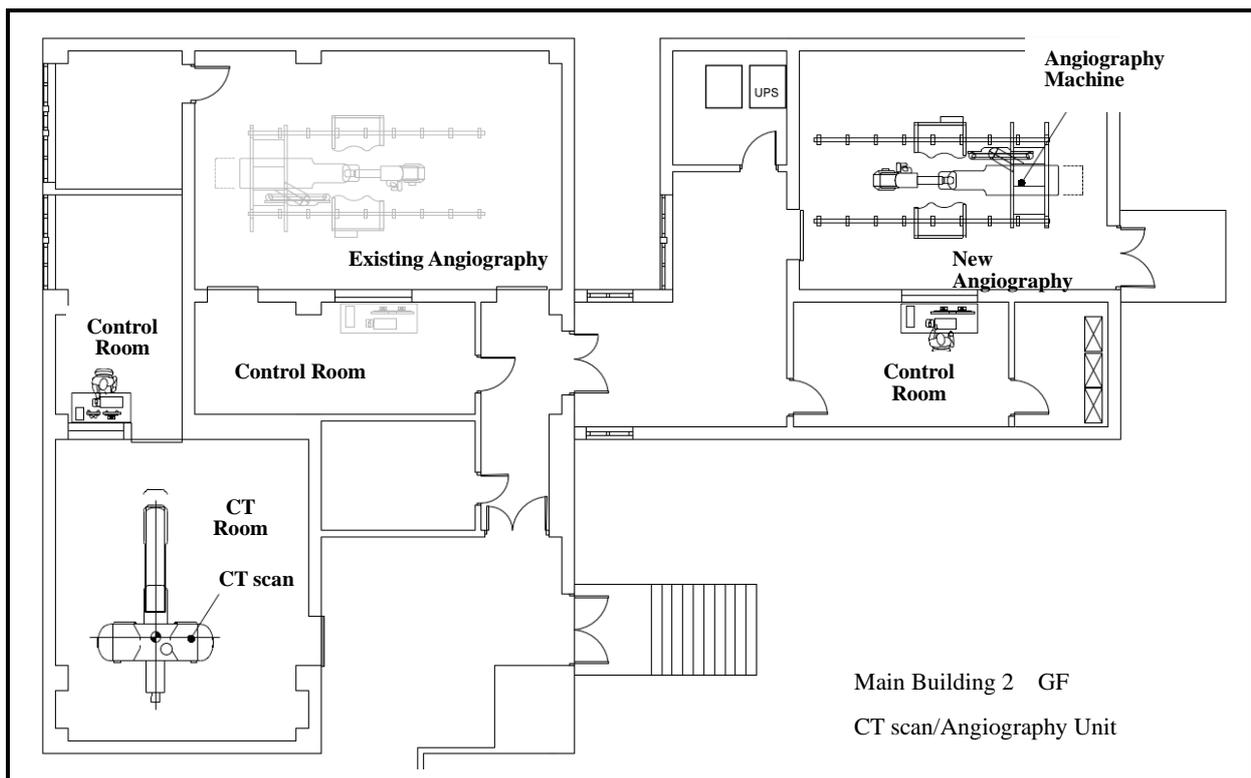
Floor Plan and Equipment Layout (Interregional Hospital)
